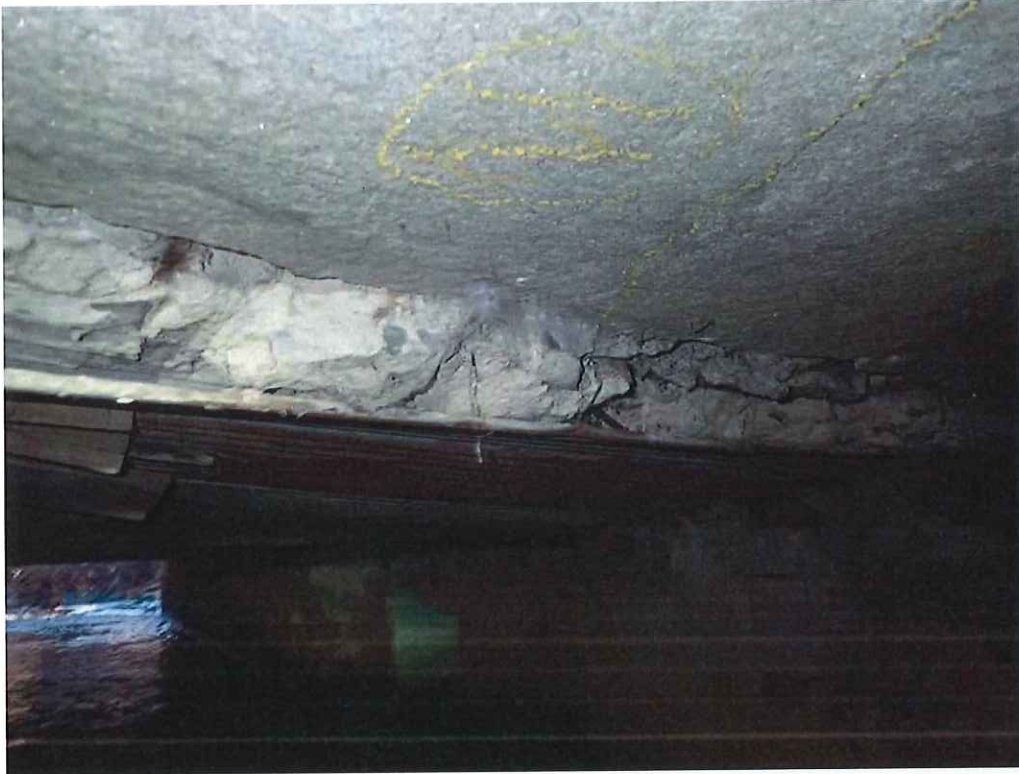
Steel Beams 2 and 3, bottom flange near East Abutment: Up to 100% section loss x 1" wide with 3/16" thickness remaining.
